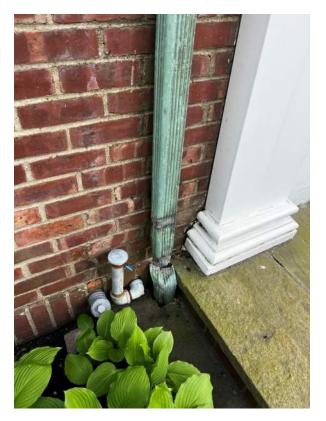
IMG_1147 - North Façade - Damaged downspout, allowing water to drain directly to foundation wall.
